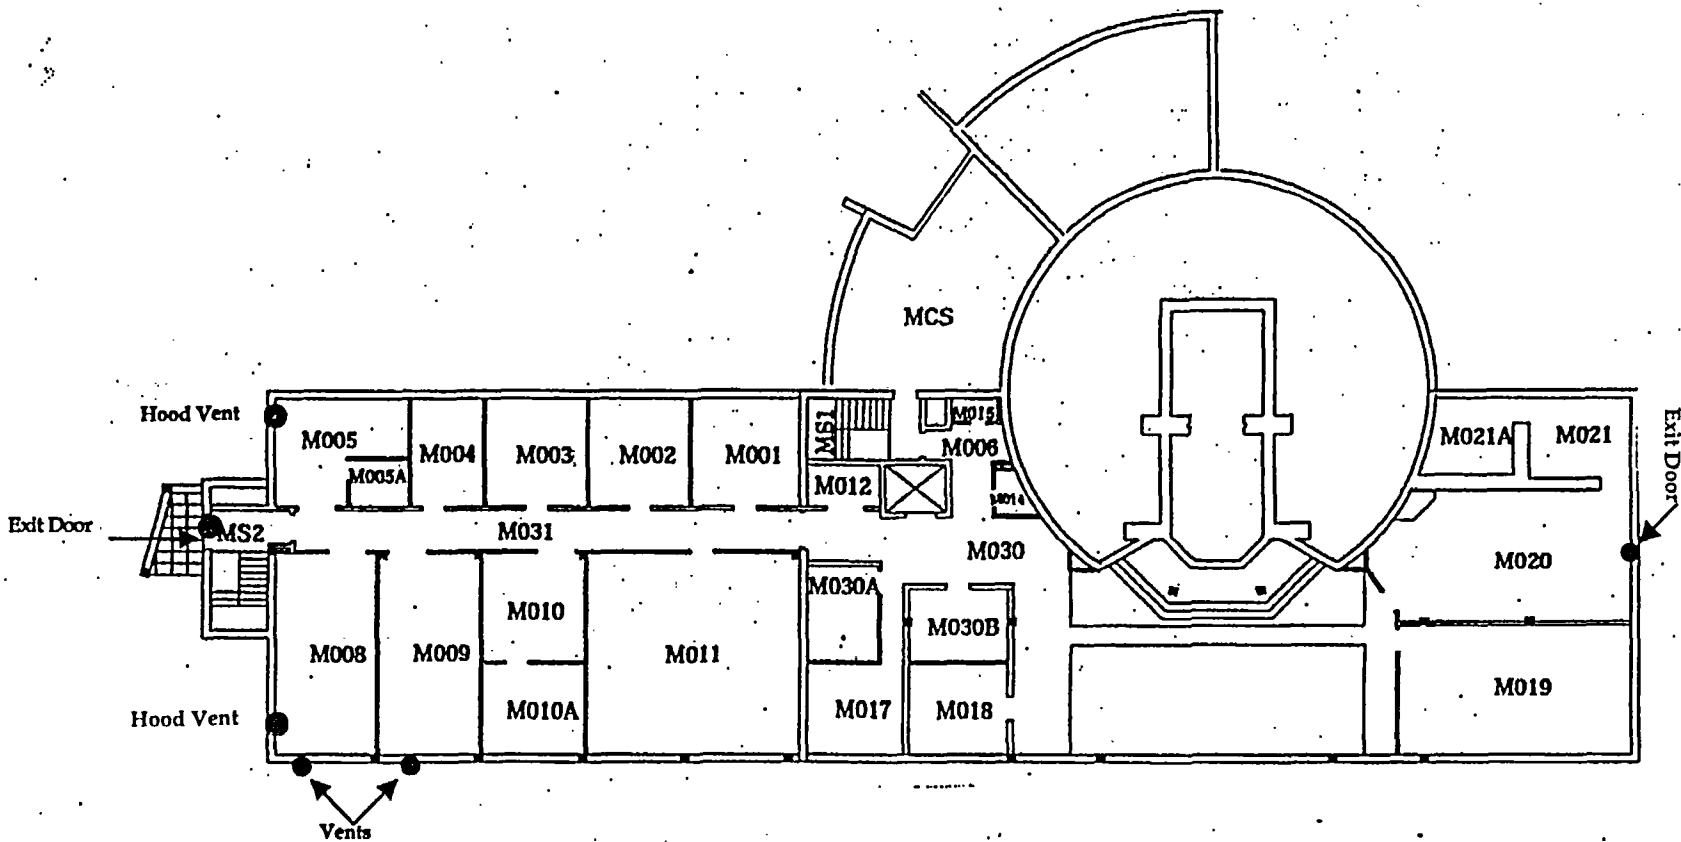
UVA Mezzanine Floor Plan View Indicating Survey Locations on Exterior Building Surfaces.
